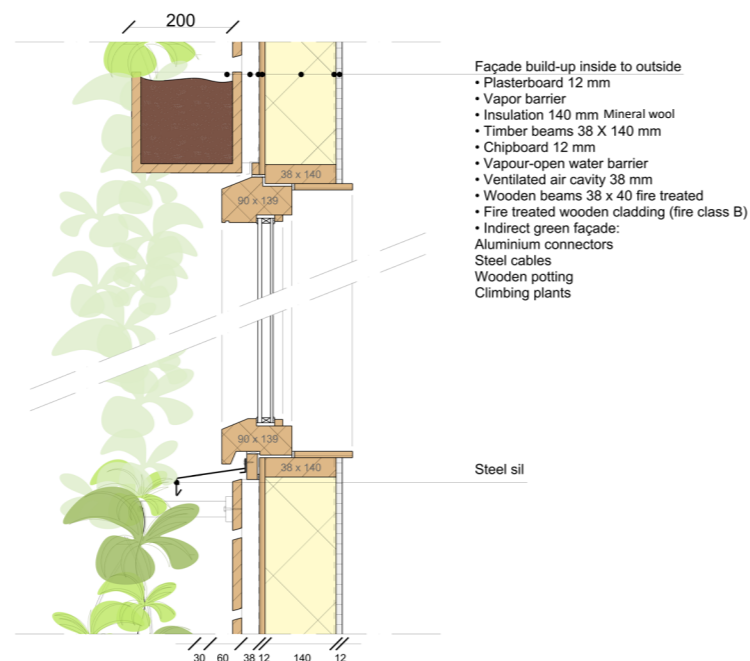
Higher risk façade detail with indirect green façade. Drawn 1:5 scaled to 1:15 (Own work)
